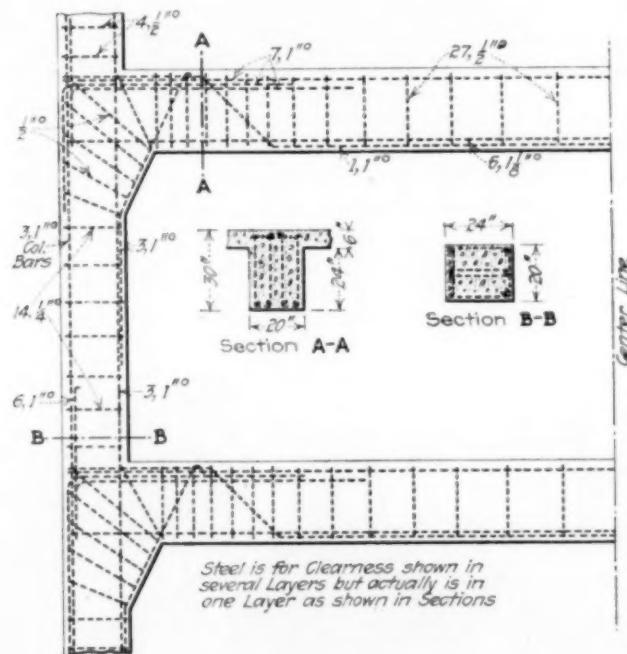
REINFORCING DETAILS AT RIGID CONNECTION OF BEAM TO COLUMN
